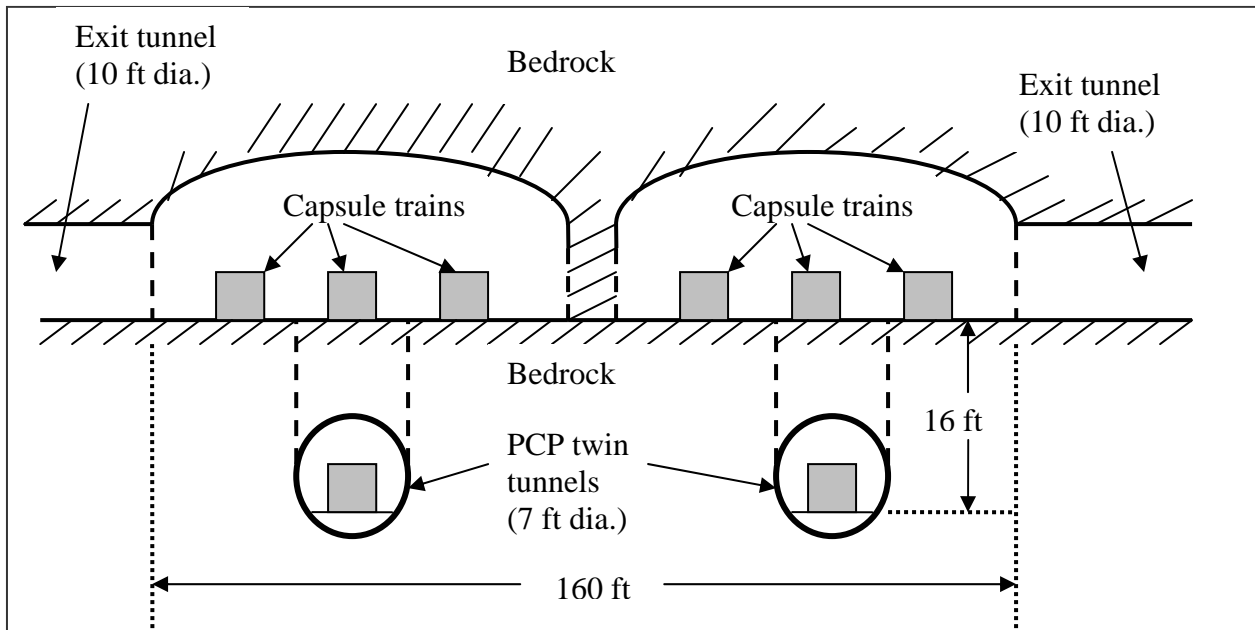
Sec.A-A (vertical cross section of a PCP station with layout shown in Fig.6)
